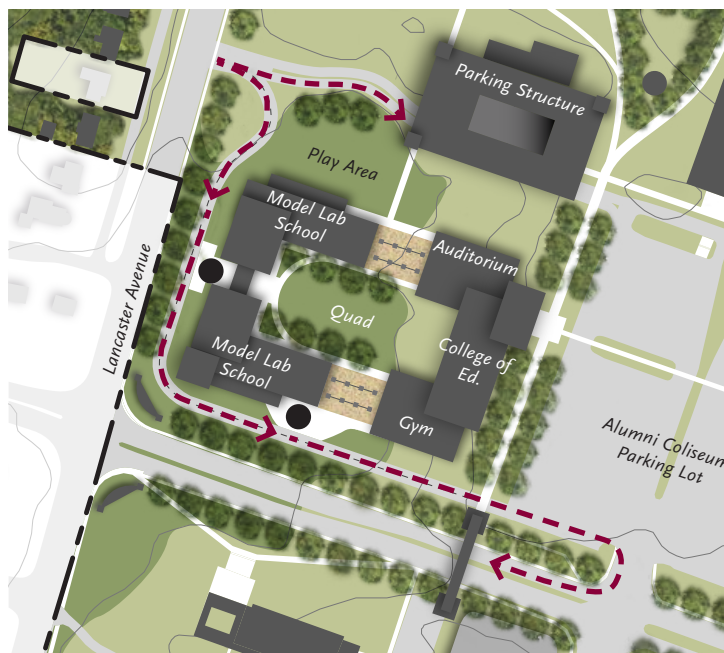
, Enlarged Plan of New Model Lab School and College of Education
